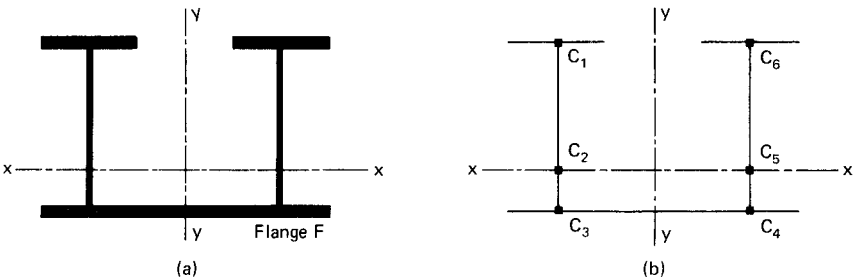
Two I sections as an example of continuously connected shear wall. (a) Prototype; (b) model.
